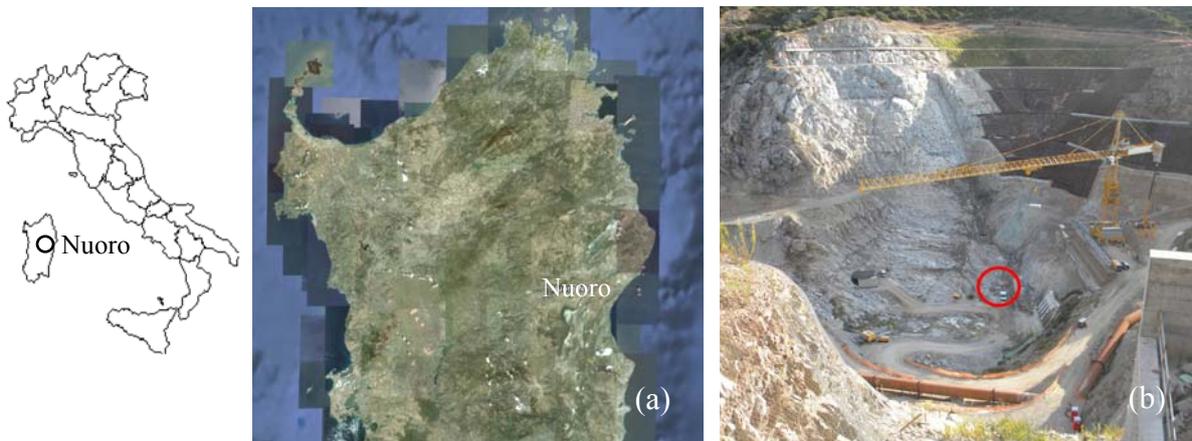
(a) Location of the dam site. (b) View of the foundation surface (right abutment, test site in red circle)
